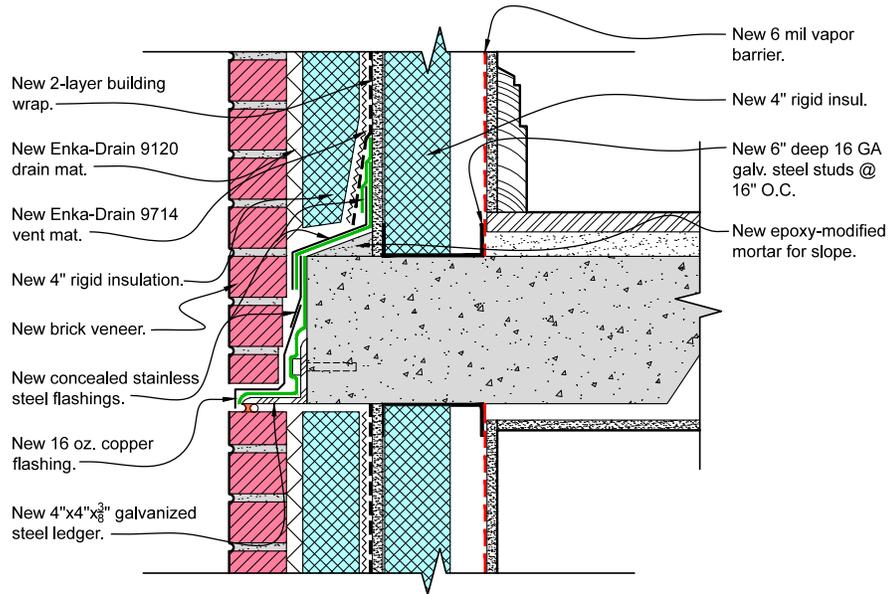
(15): Option 3 New Masonry Veneer Appr. at Typ. Floor-Level Ledger
